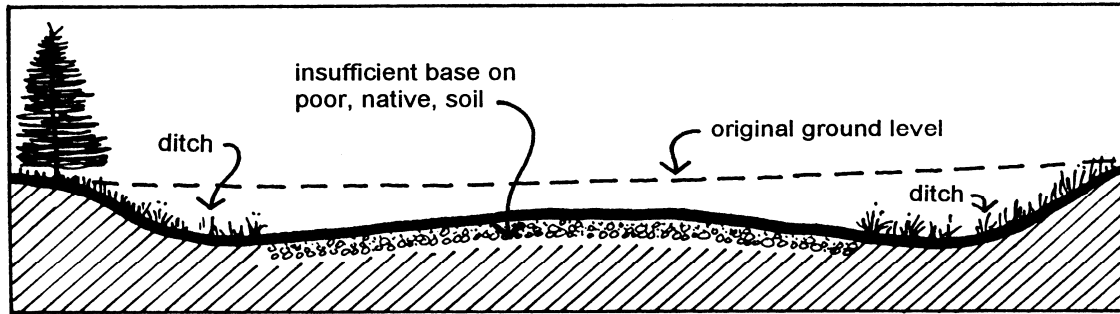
Poorly constructed road: poor base and inadequate ditching.
